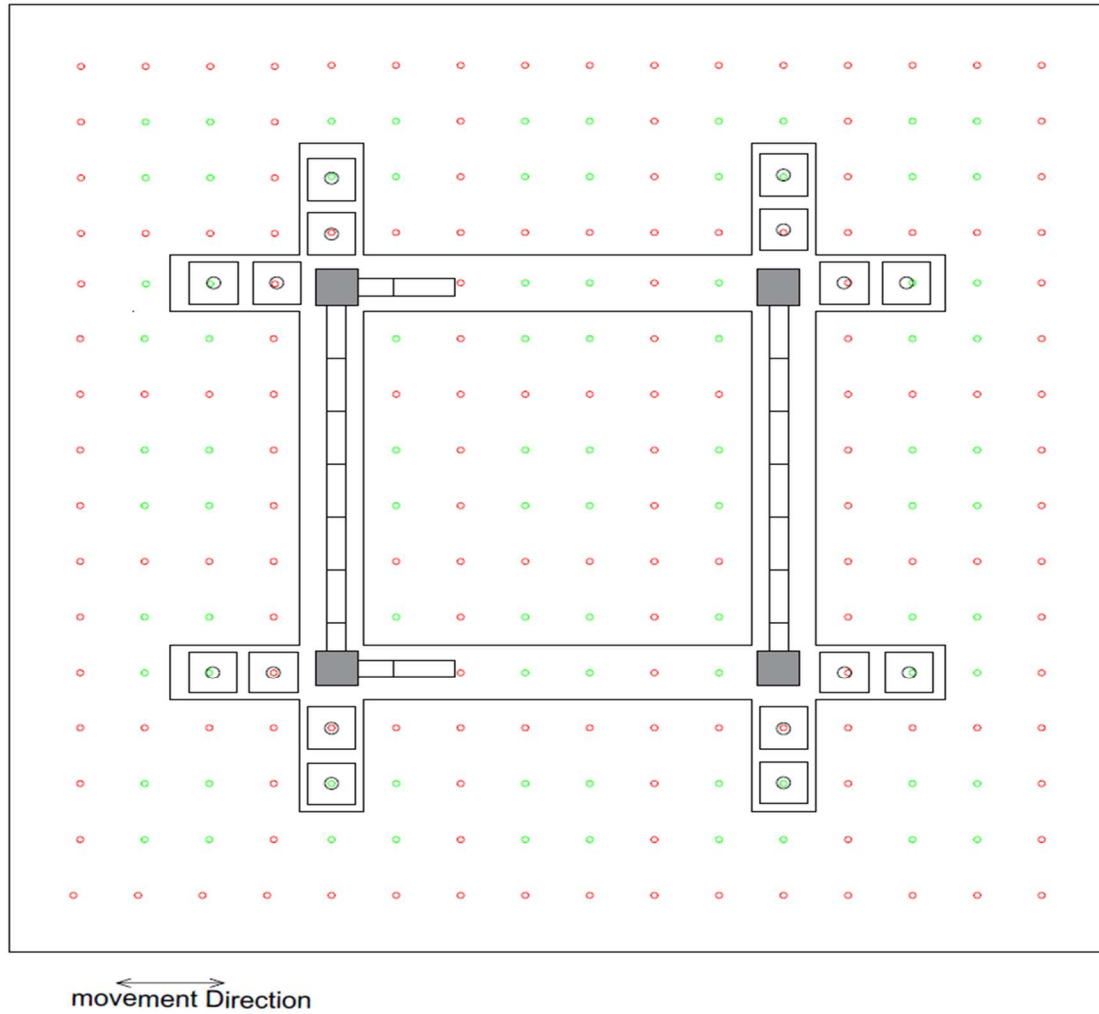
Fixing of the specimen on the shake table with steel bolts
